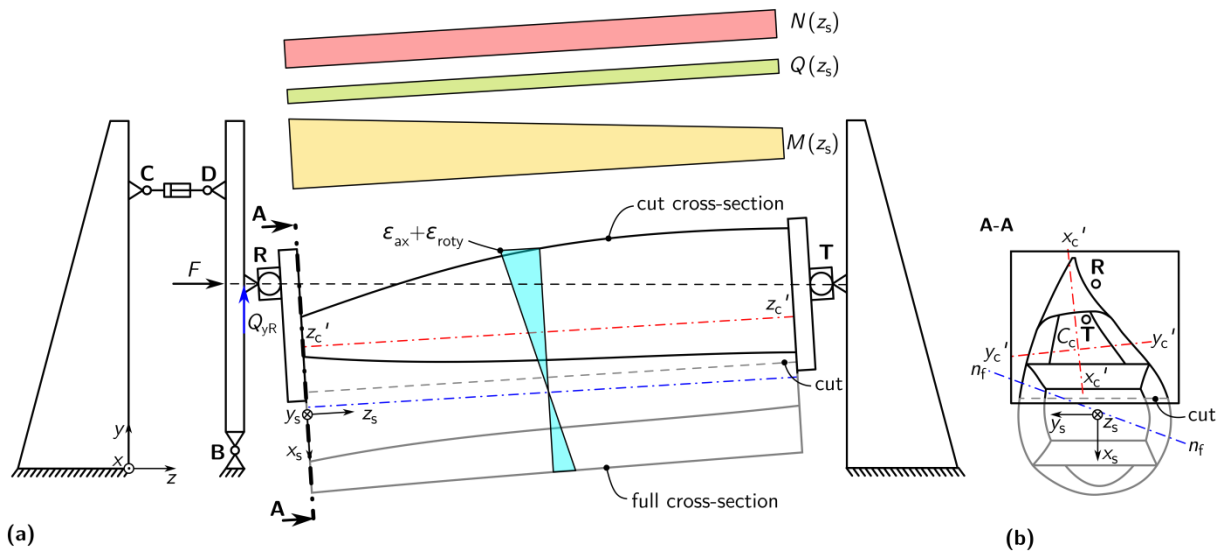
Side view of the setup (a): a segment cut cross-section (black) of a full cross-section (grey) is cut out and clamped between ball joint R and T. Ball joint T is connected to a stiff wall. Ball joint R is connected to vertical beam, which is mounted to a strong floor at hinge B. An adjustable actuator connects the beam at joint D with another stiff wall at joint C. The front view into plane A-A is shown in (b).
